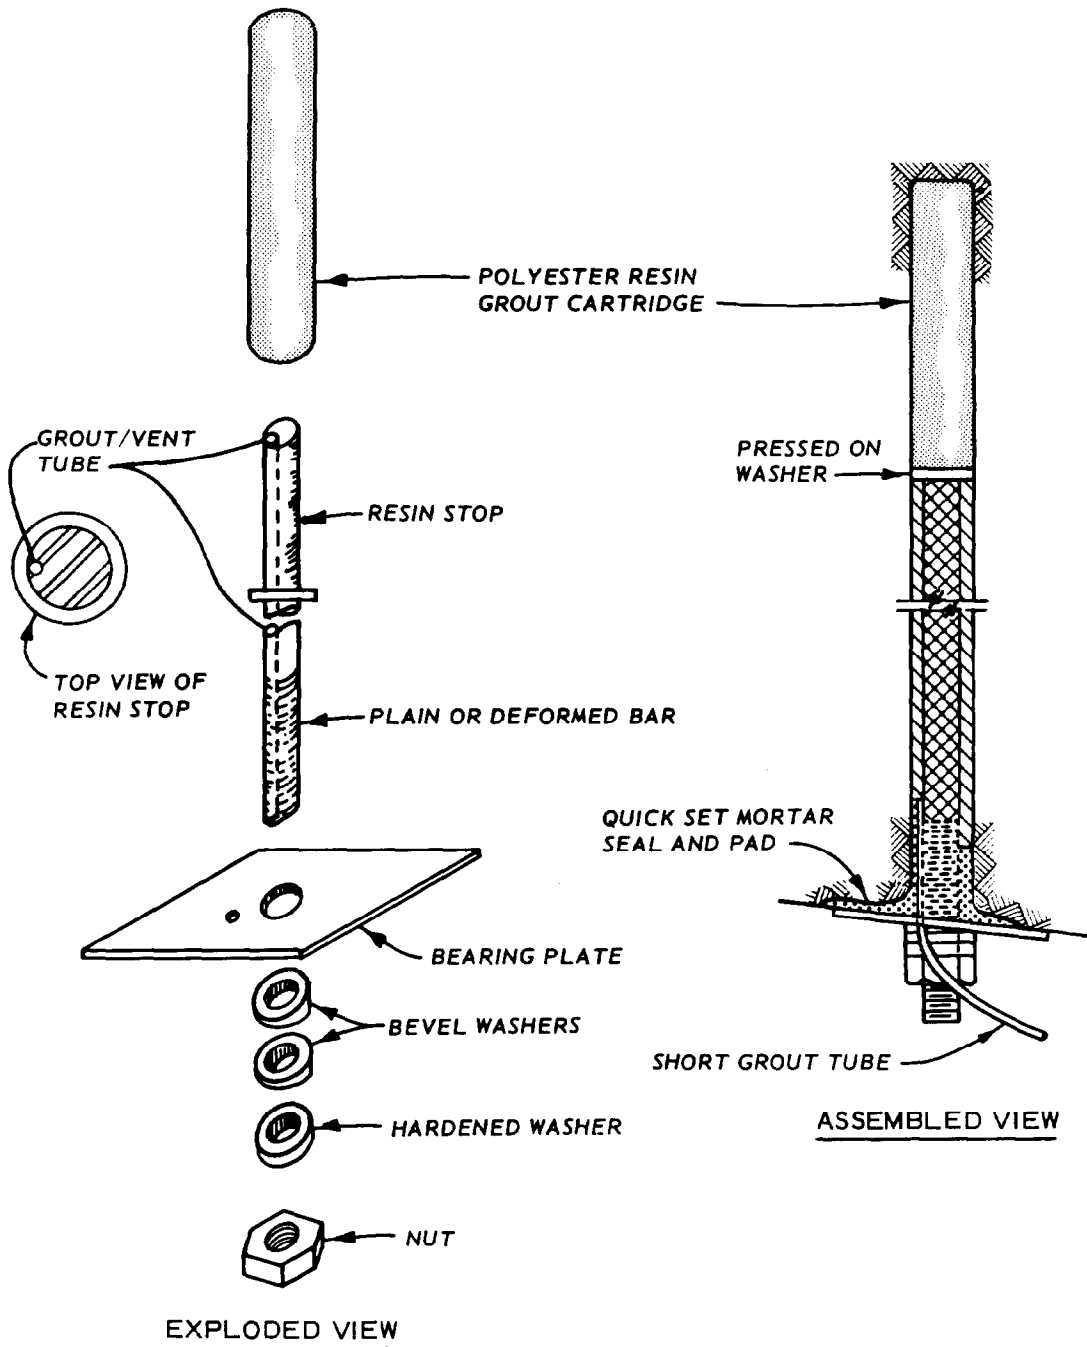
Cement groutable rock bolt with resin anchor stop and integral grout tube.
